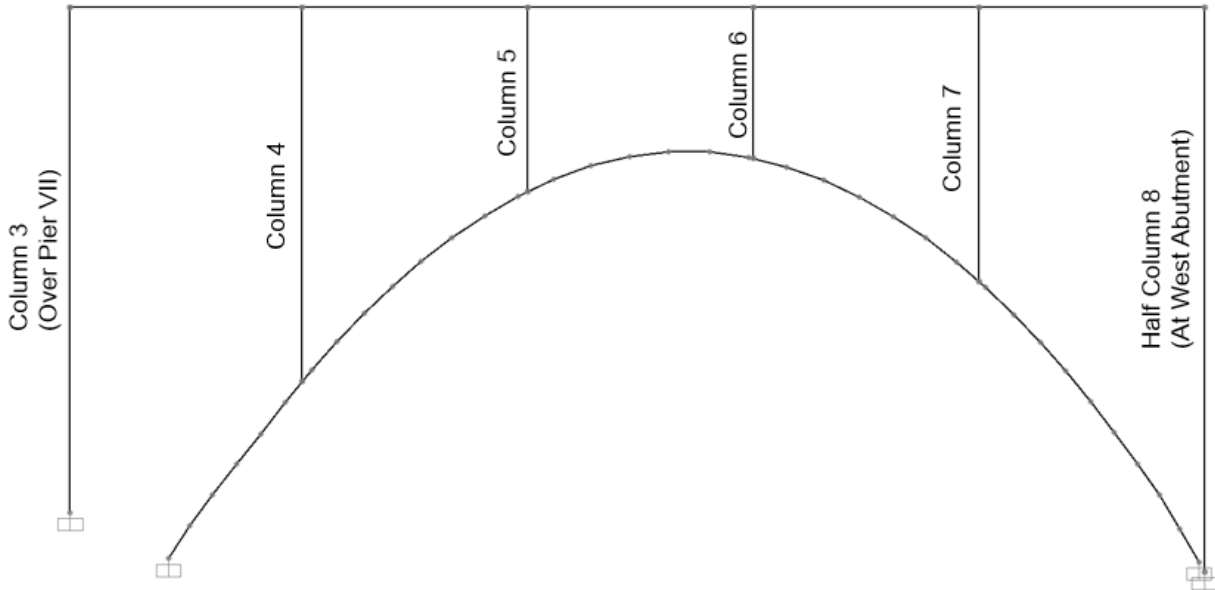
Span VII Naming Convention (SAP 2013) (Duplicate - Figure 6)
